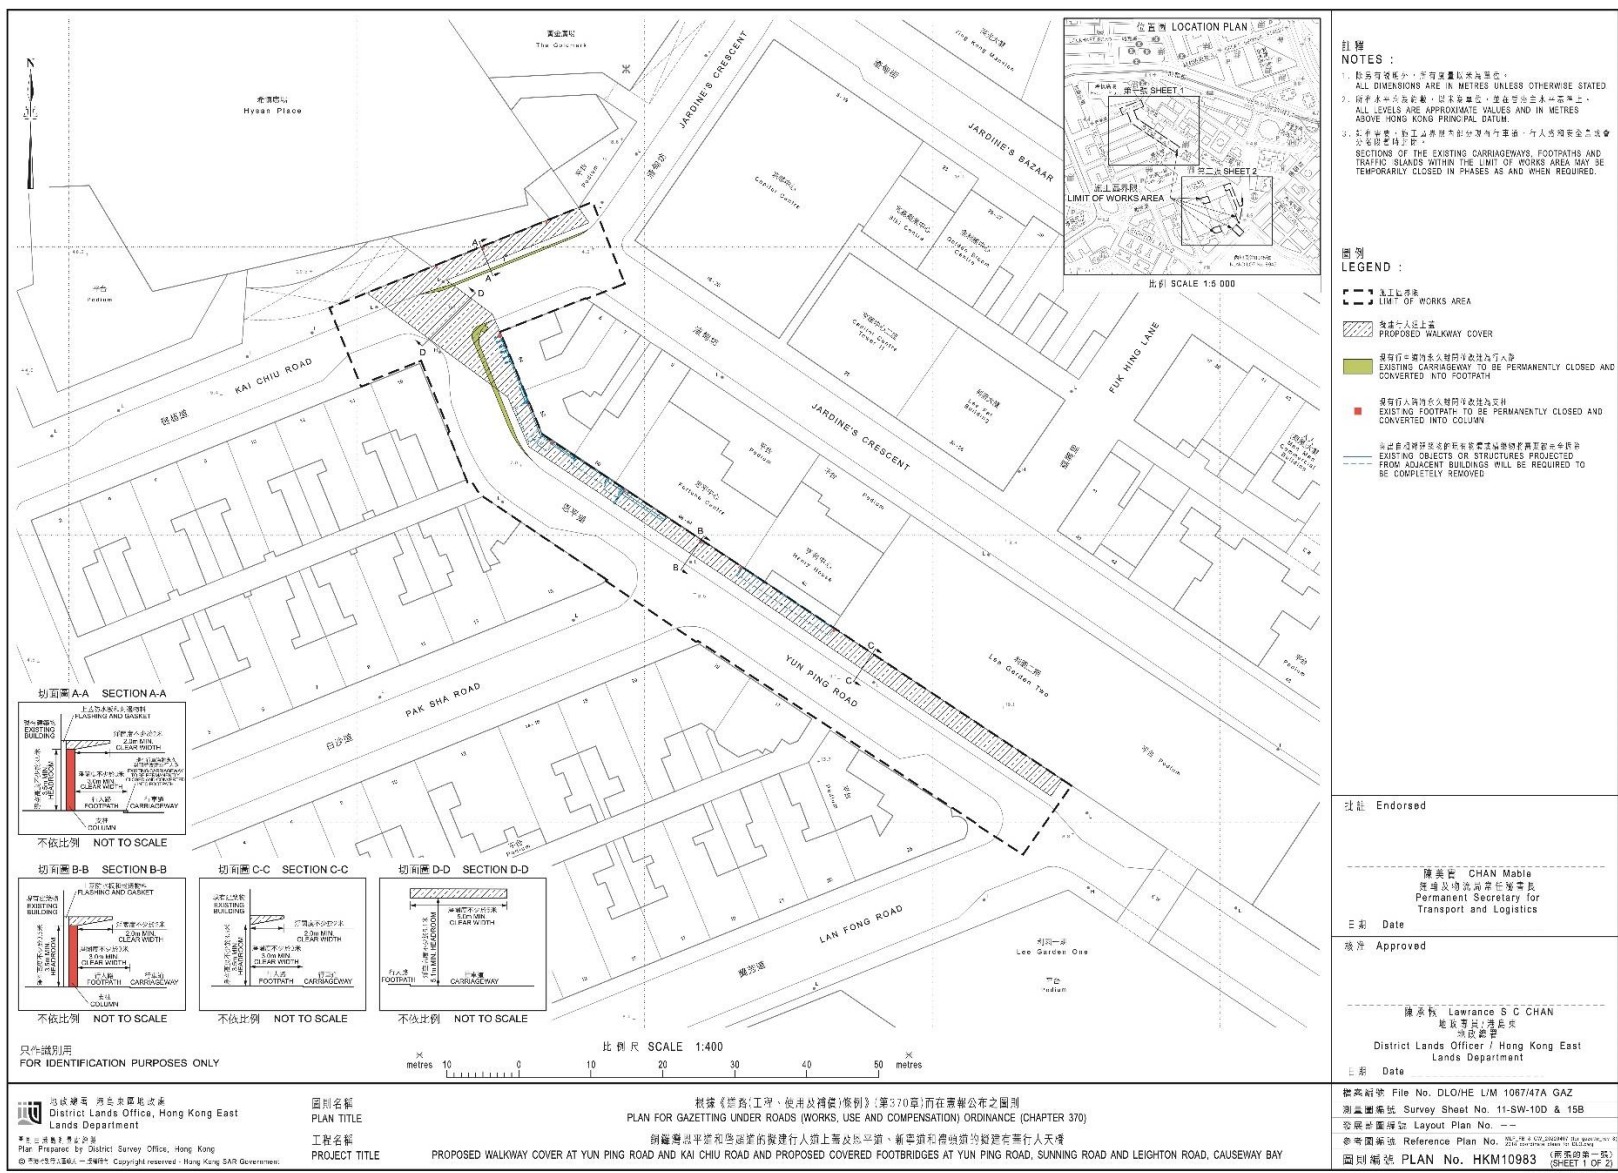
Plan showing the location of the covered walkway at Yun Ping Road and Kai Chiu Road, Causeway Bay.
